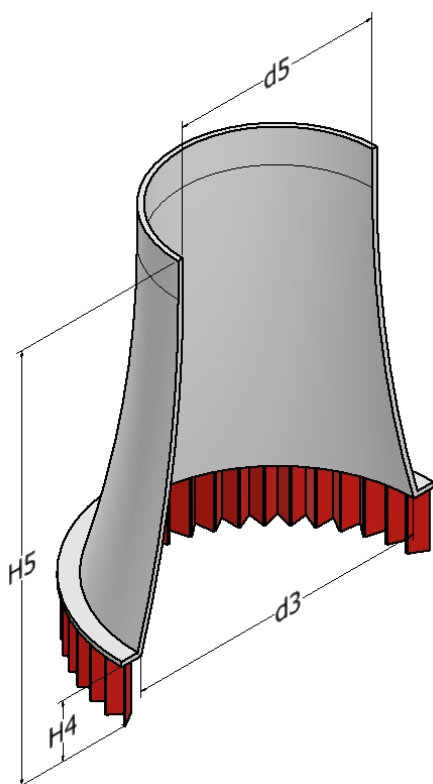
Schematic section of NDACC geometry with reference dimensions.
